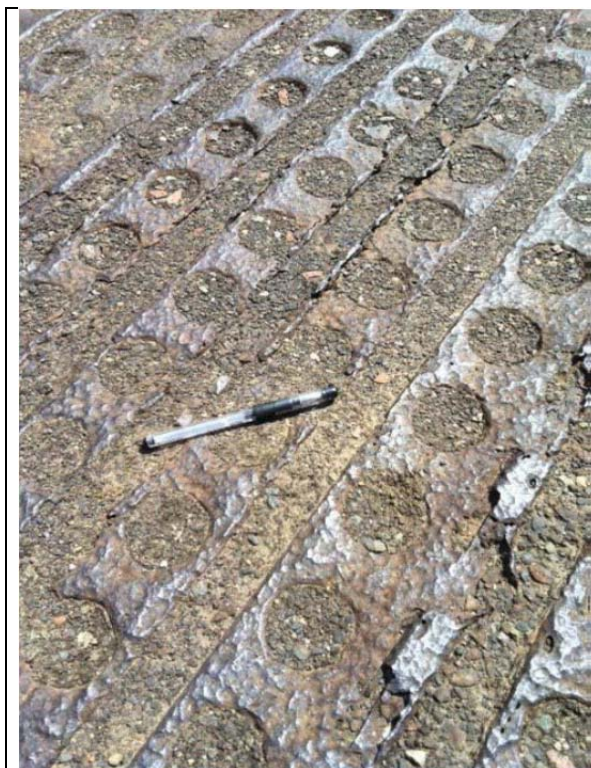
Truck storage yard- Semi pervious- Metal on ground to reduce mud.
